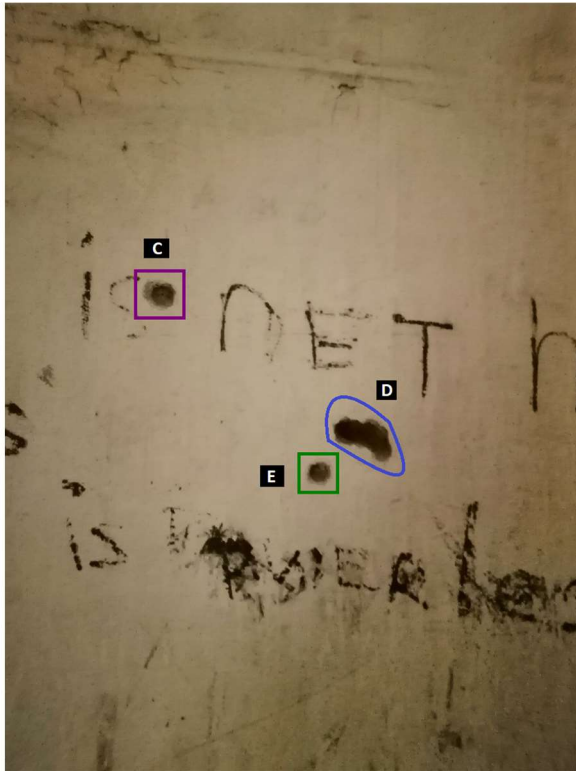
Area of loss, lacuna 5, South wall. Photograph by author.
